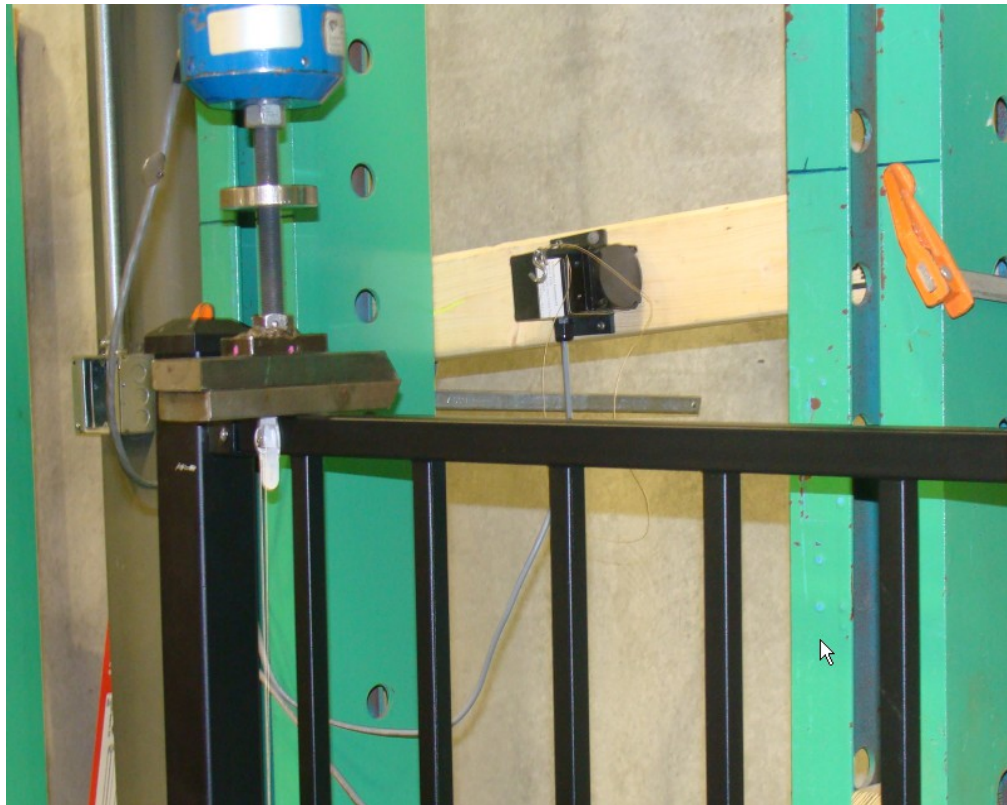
200 lbf Load Applied – Vertical Near Post Connection
